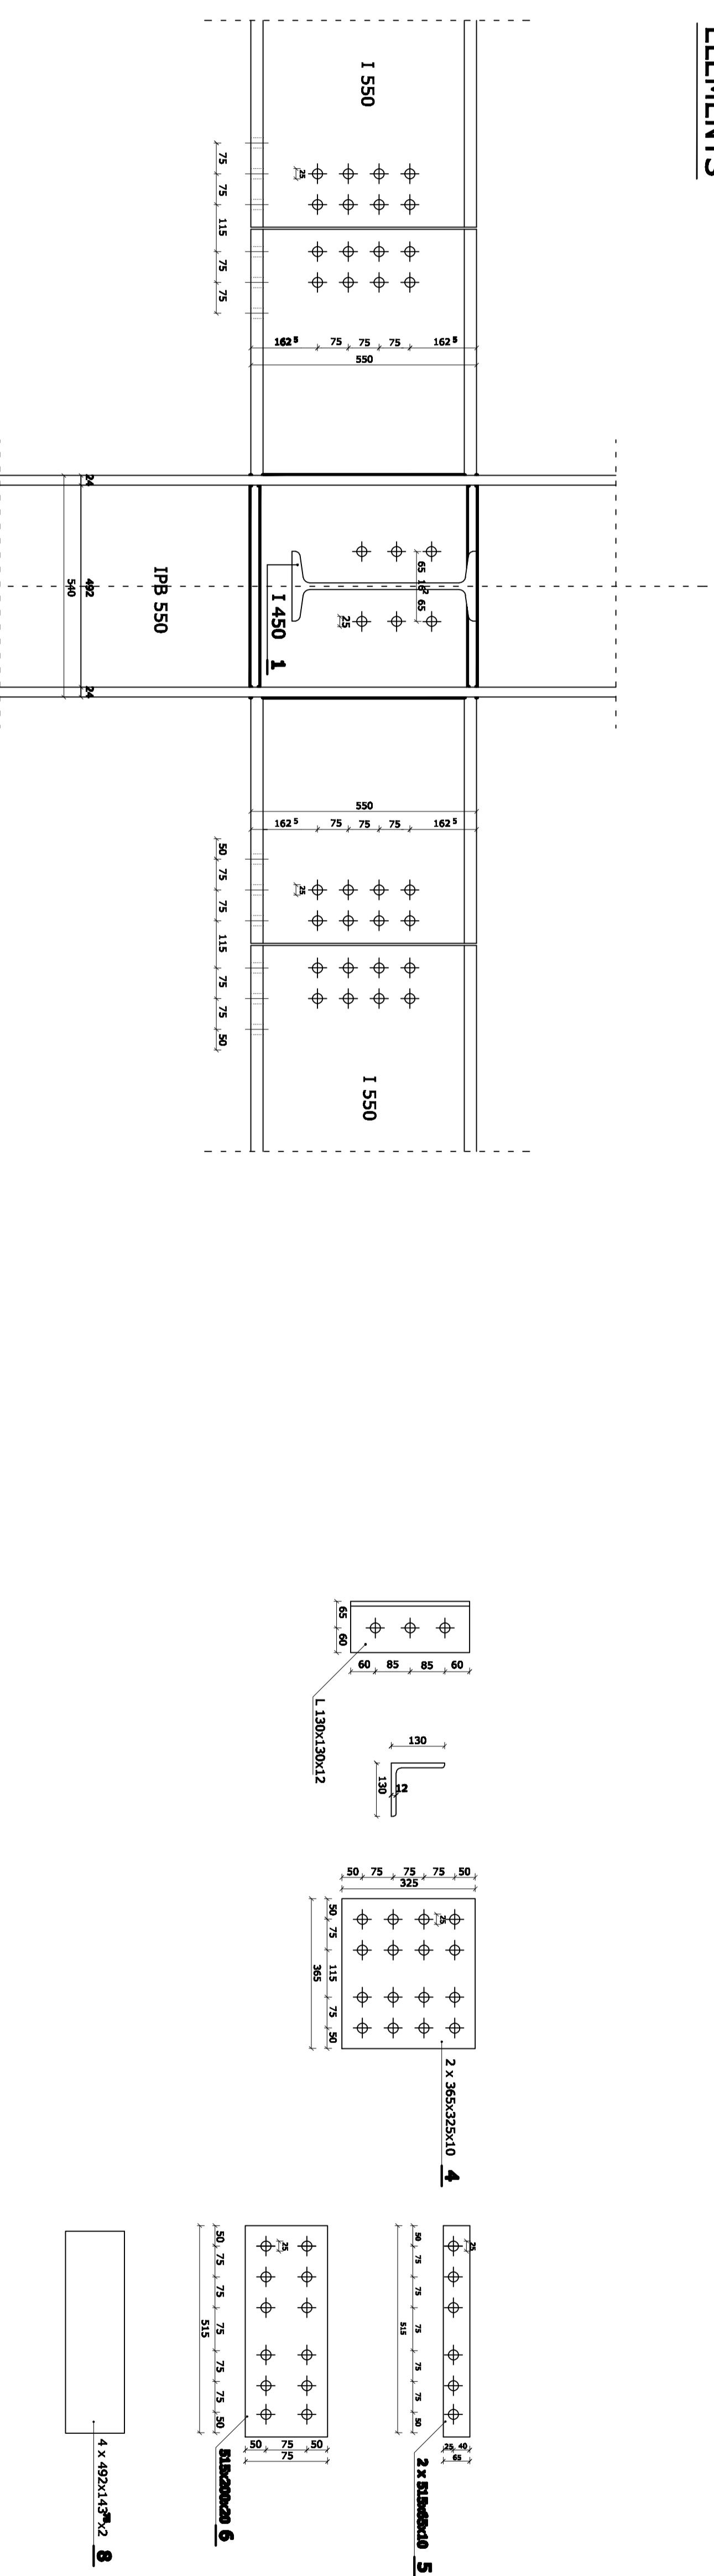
CONNECTION - PREFABRICATED ELEMENT 1 TO PRIMARY BEAM 1:10
